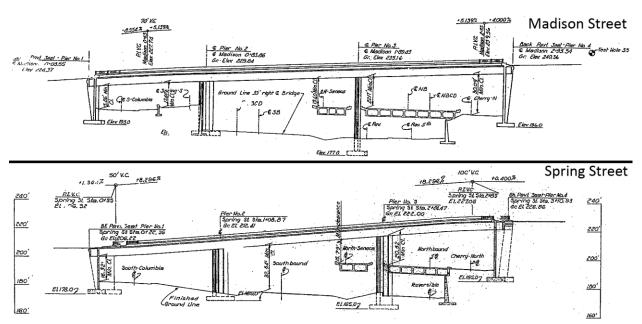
Top: south elevations of the Madison Street and Spring Street overpasses.
